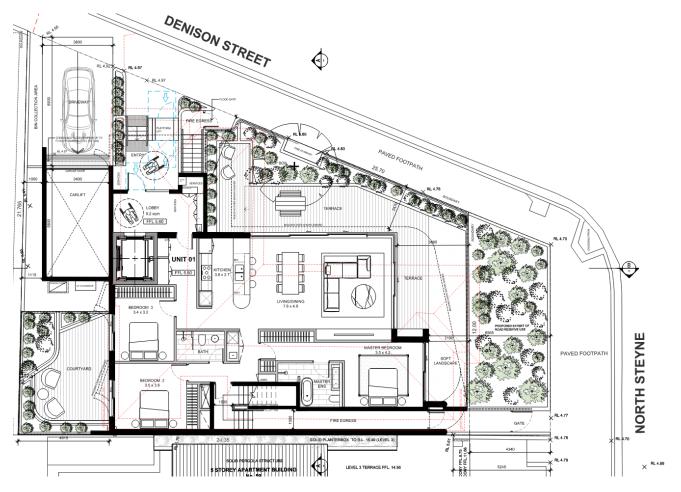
Proposed Ground Floor Plan (Source: Platform Architects - A1.03)
